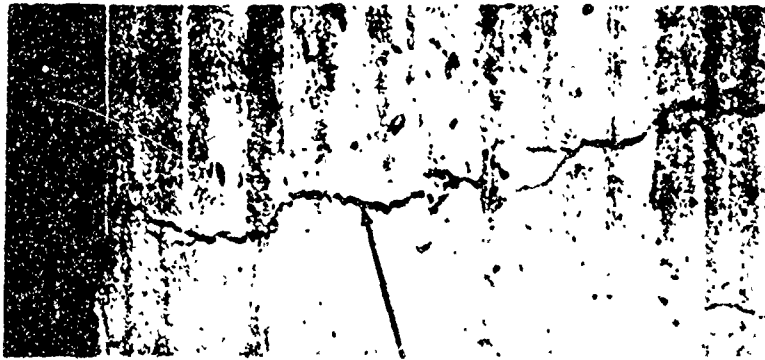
Close-up of $\frac{1}{4}$ -inch crack in bottom of Conduit 3.2e, postshot.
